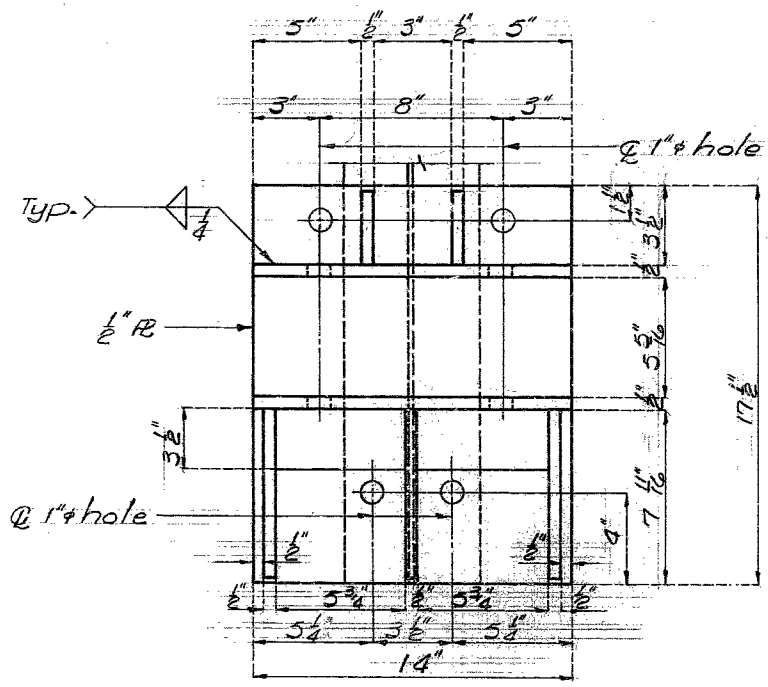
DETAIL OF RAIL EXPANSION OR SPLICE JOINT
